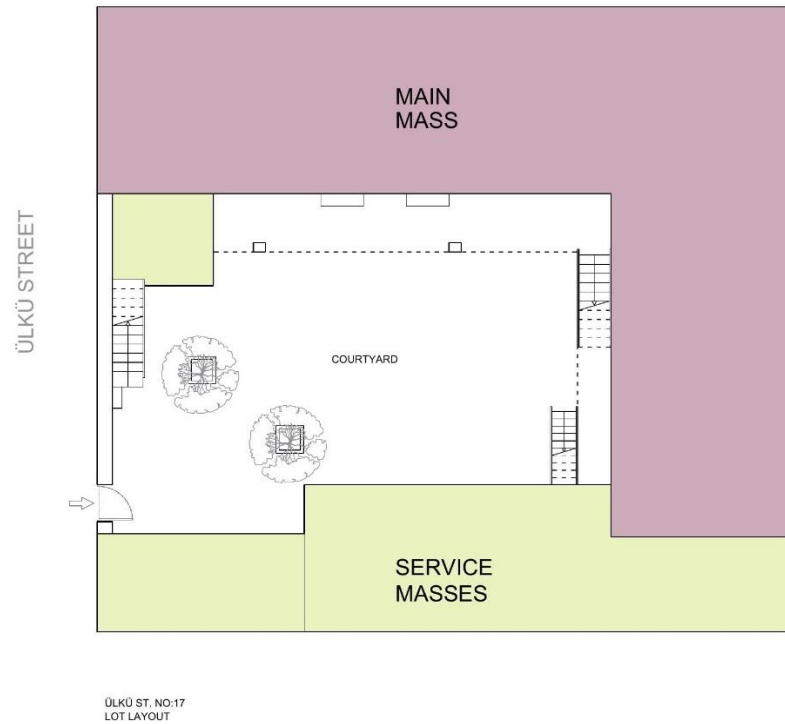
Ülkü-17 House lot layout (Author, 2023)
